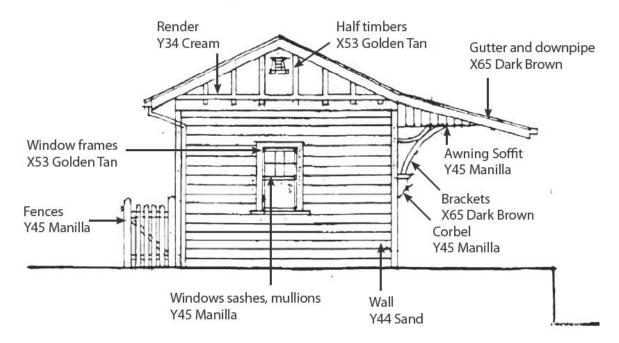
Side Platform Buildings - Timber / Concrete Slab
